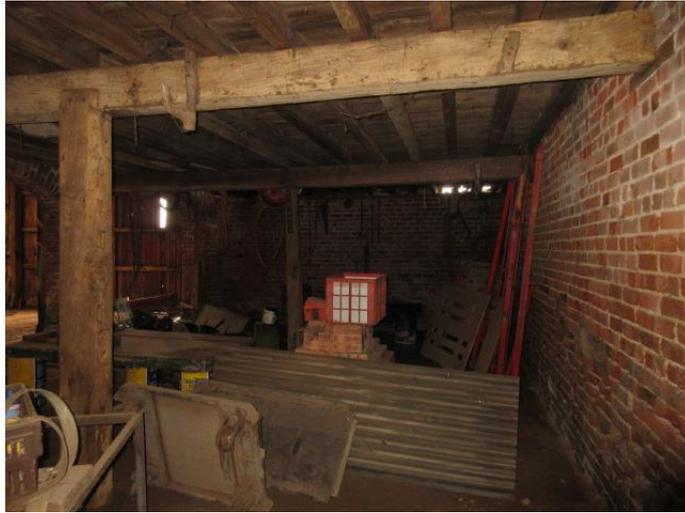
(Typical Internal – 2 Storey Element – Ground Floor Walls)
